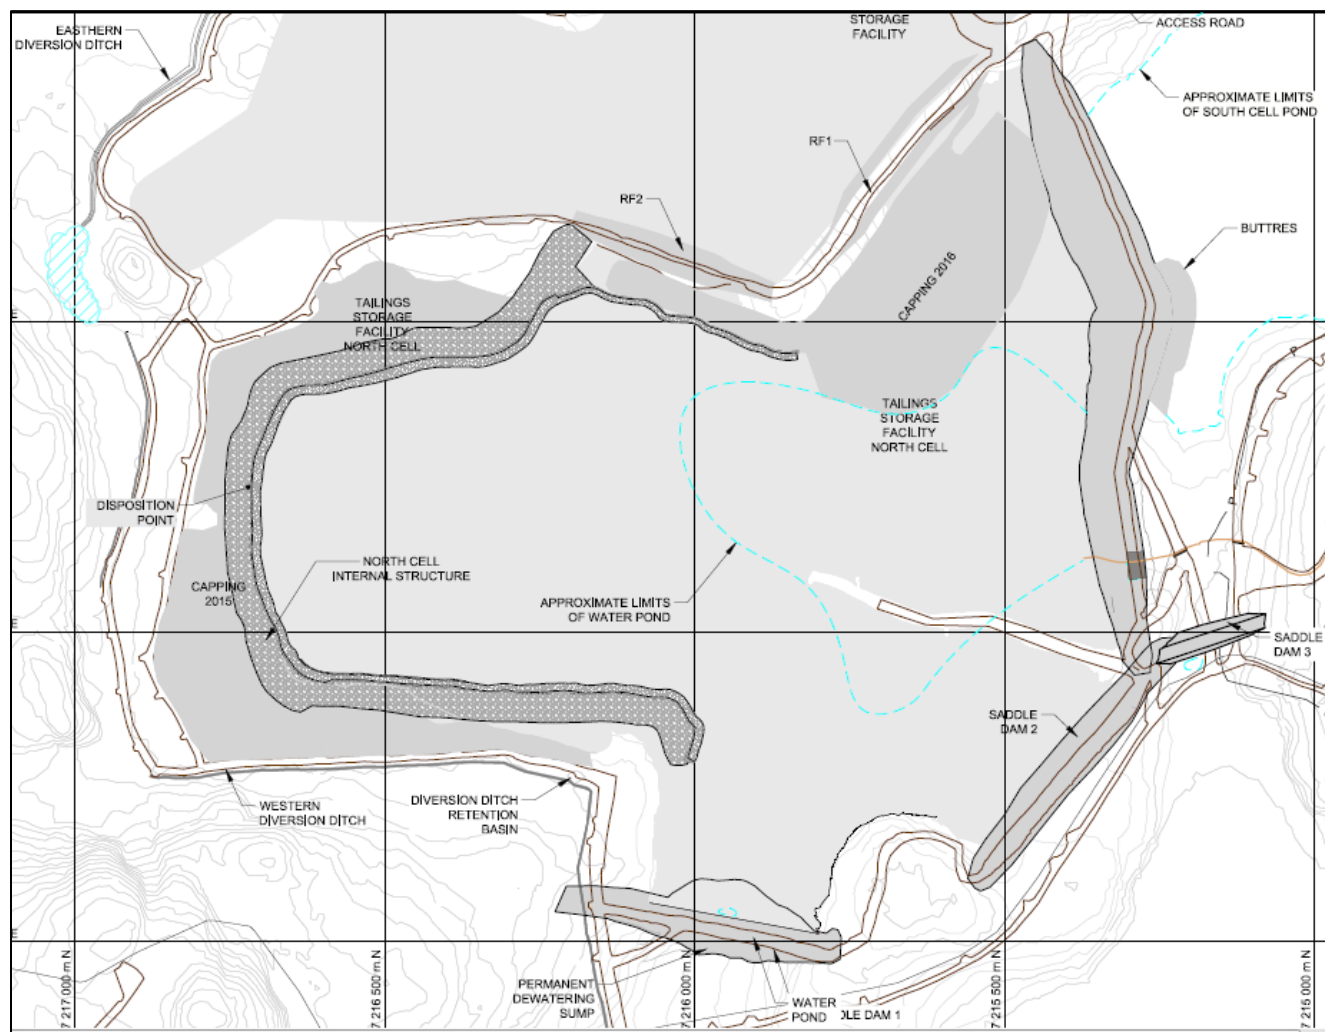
Layout of the North Cell of the Meadowbank Tailings Storage Facility
